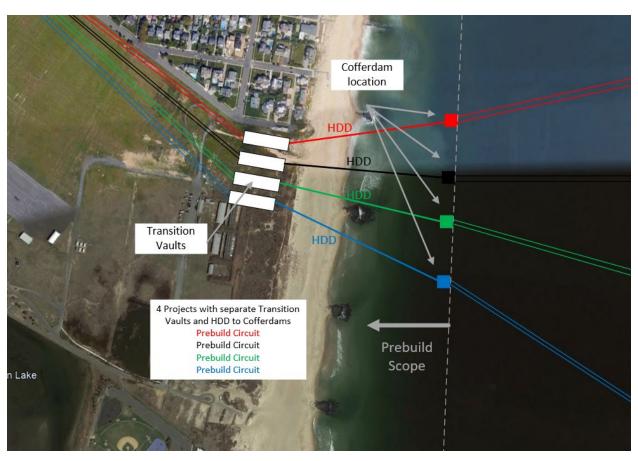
Illustrative Example of General Arrangement at Landfall
